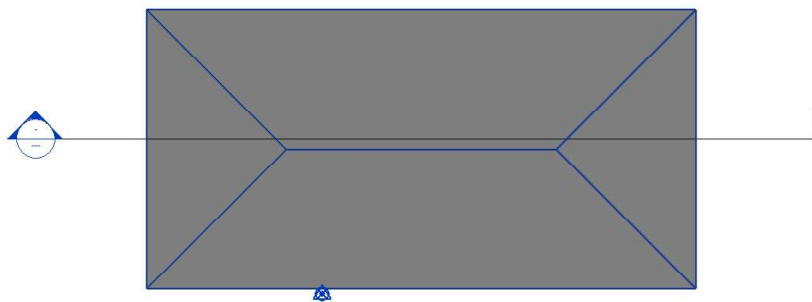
Mass plan of the models showing the orientation East-West towards South. Source: Revit 2020 on 31-05-2020
